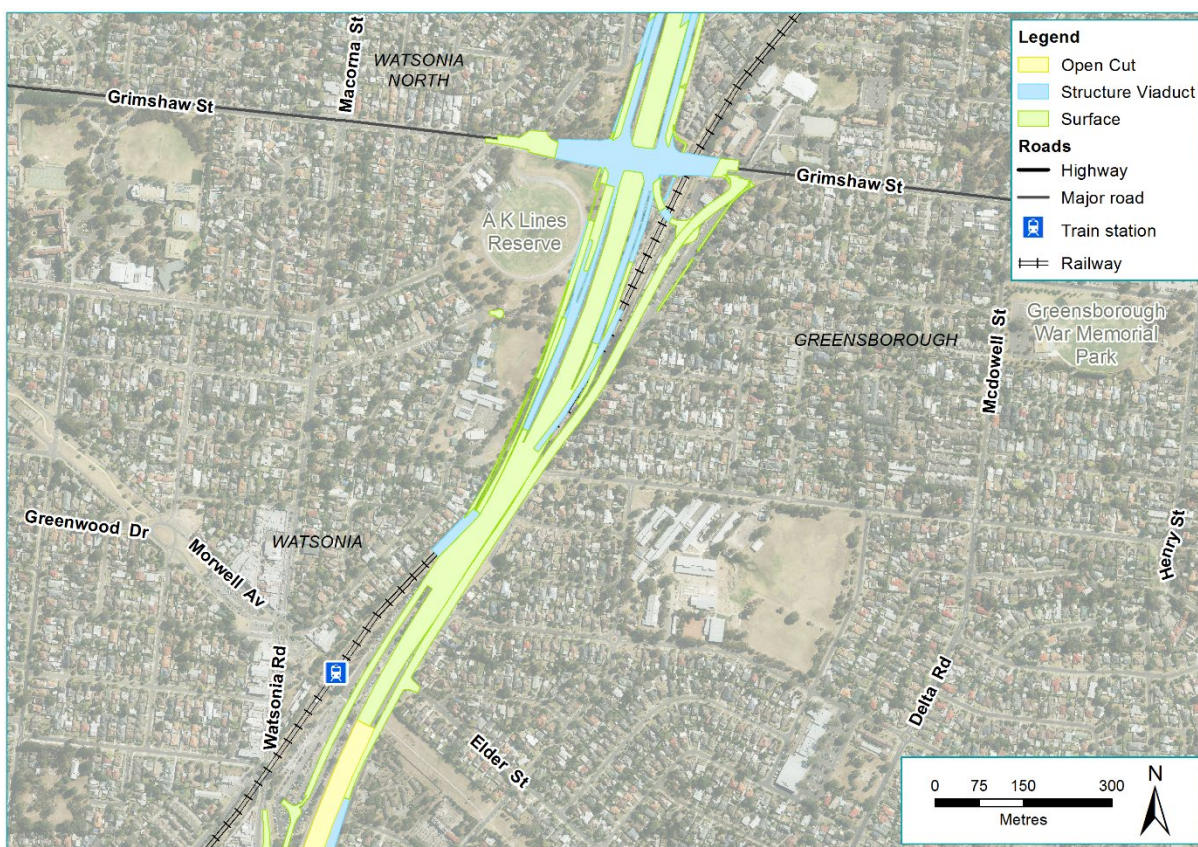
Option A: Grimshaw Street service road layout – no interface
